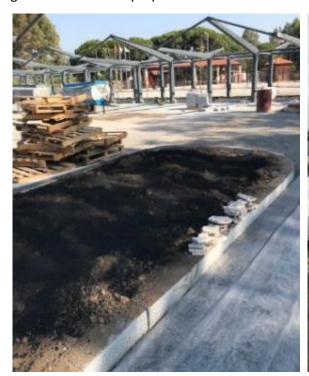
Biochar (smart soil) implementation, ivy plants and tree planting
